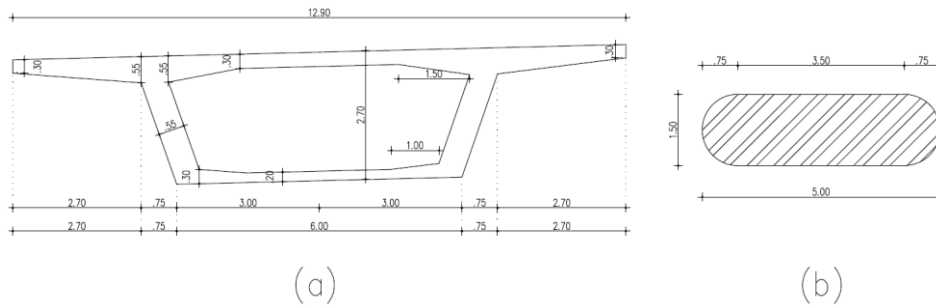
(a) Cross section of the deck at mid-span – (b) Cross section of the piers
